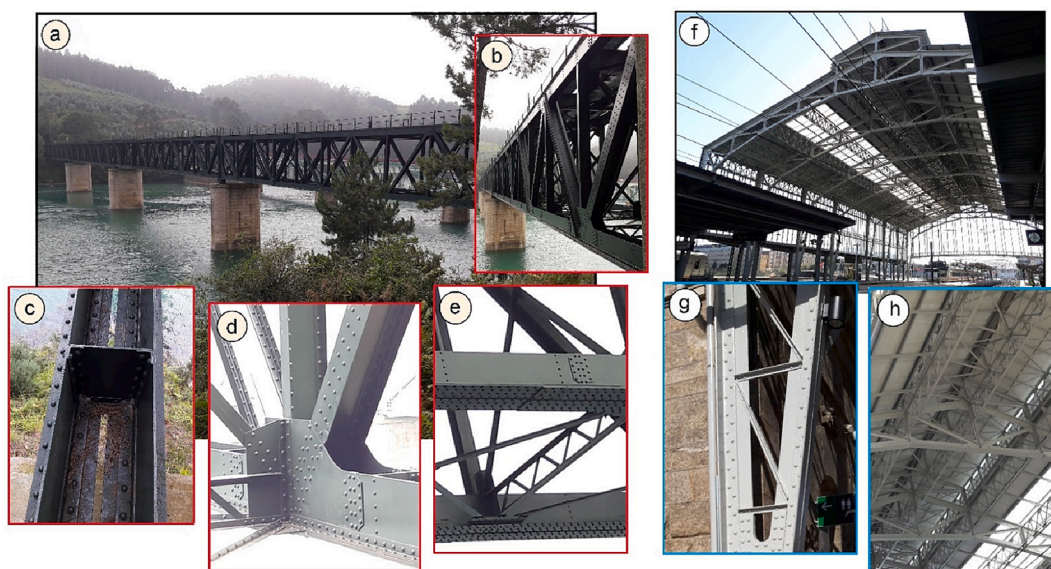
a) Example of a historic steel railway bridge in service b) Detail of the exterior of the structure, which is very difficult to access c) Lower chord where new structures can be anchored using a clamp-based connection system d) Detail of the interior of the bridge showing the connection between the gusset plate and the lower chord e) Detail of the rivet heads on the underside of the bridge chords f) Example of a historic steel building currently in use as a railway station g) Detail of the riveting of the profiles of a column h) Detail of the roof truss.
